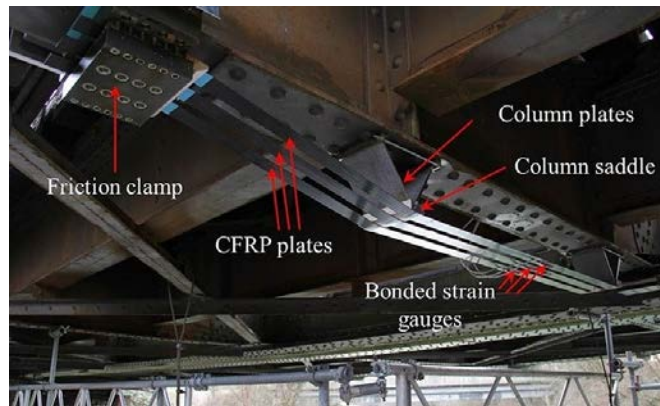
Strengthening of a steel bridge by using CFRP strips, [13].
